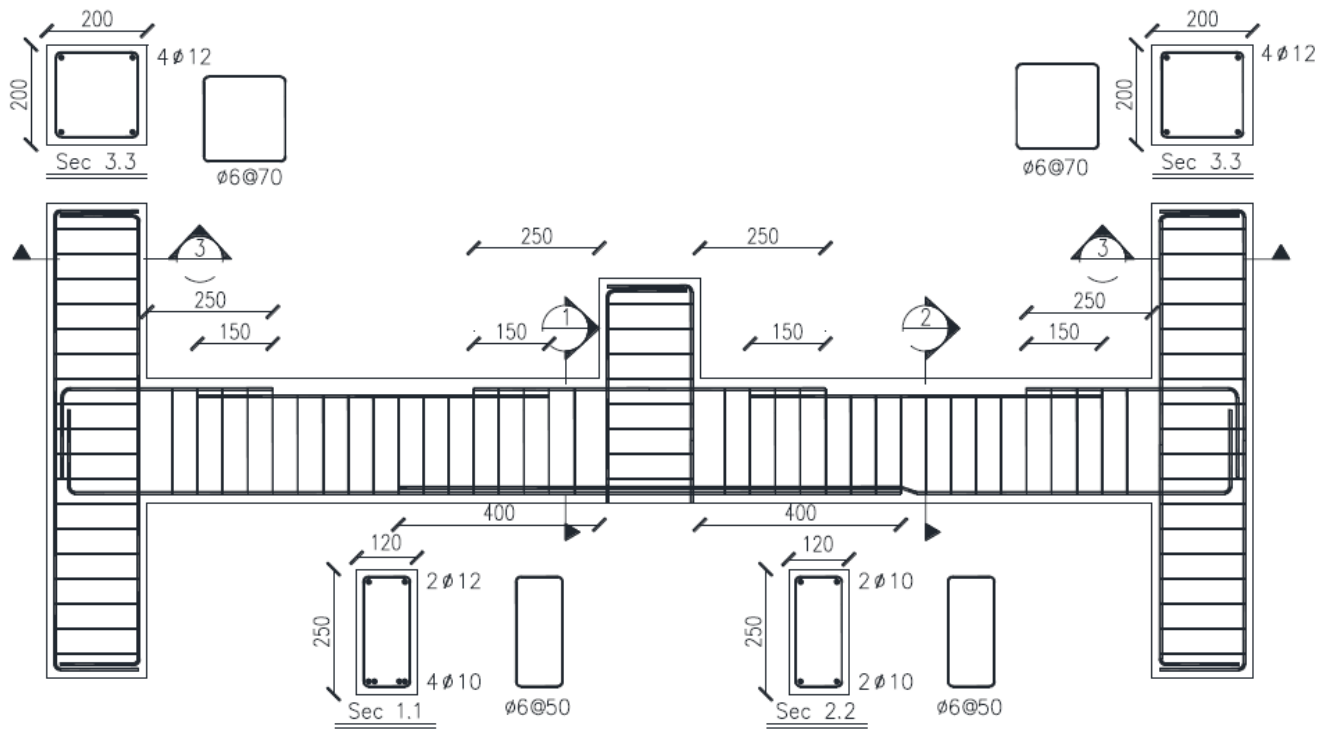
Reinforcement details of specimen S5. (Seismic Detailing).
